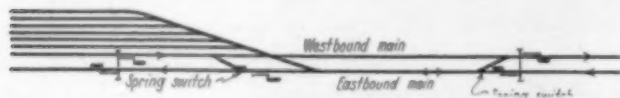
Layout at Proviso Yard Where Two Spring Switches Are Used
